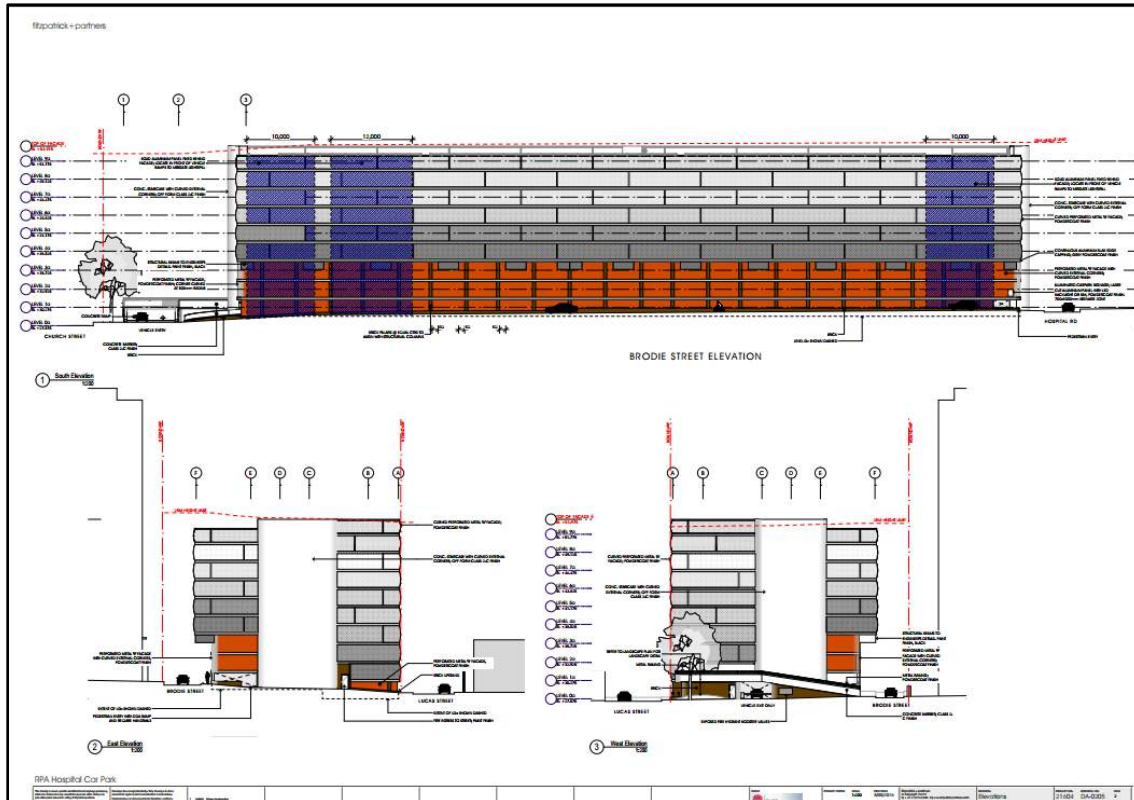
DA-0205 Elevations (Source: Fitzpatrick + Partners, 05.05.2016).
